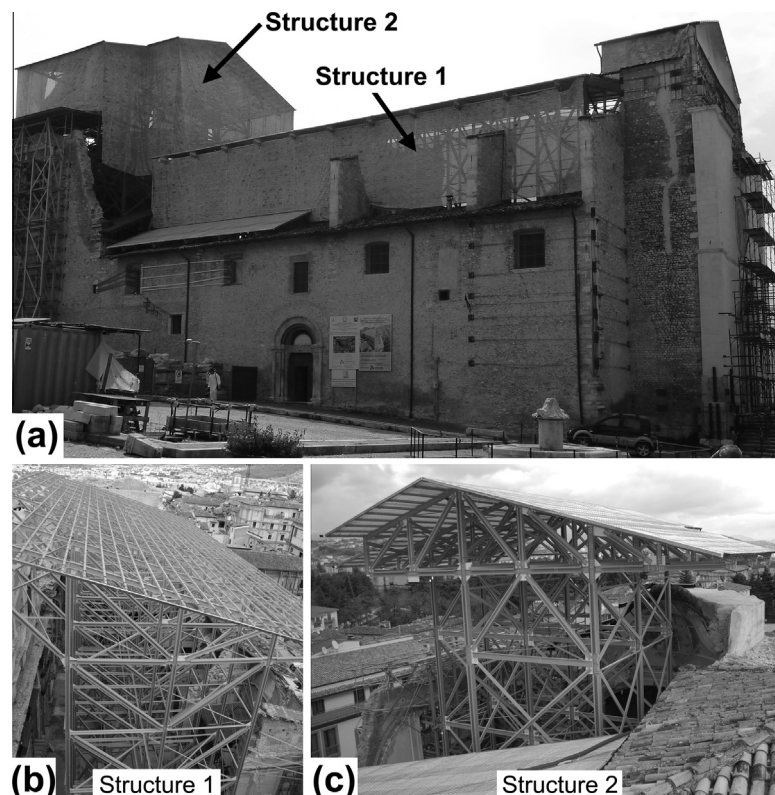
External view of the church and pultruded FRPs structure (a); detail of PFRPs structures 1 “low” (b) and 2 “high” (c).
